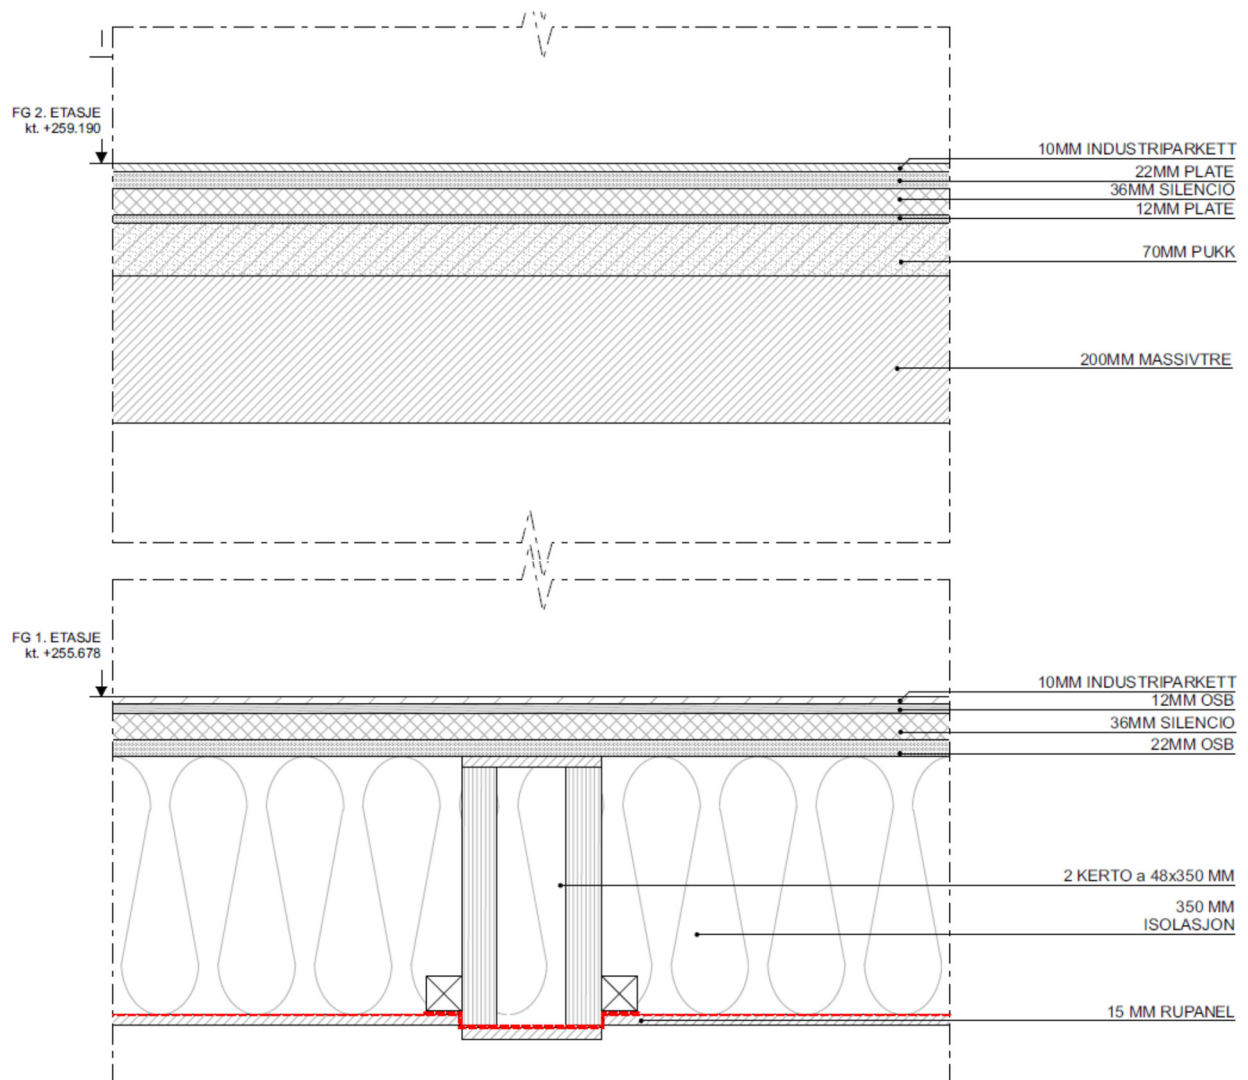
Detail of ground floor (below) and first (above) floor, courtesy of Ola Roald AS.
